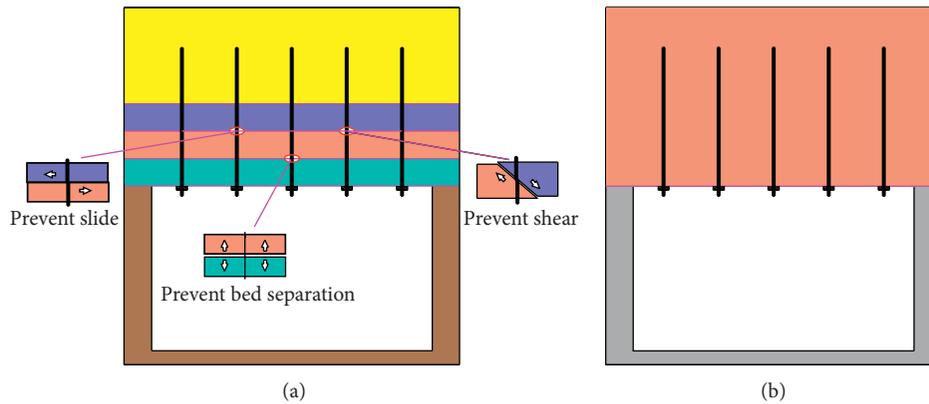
Schematic diagram of bolt support mechanics for different types of roadway roof. (a) Layered roof (b) Nonlayered roof.
